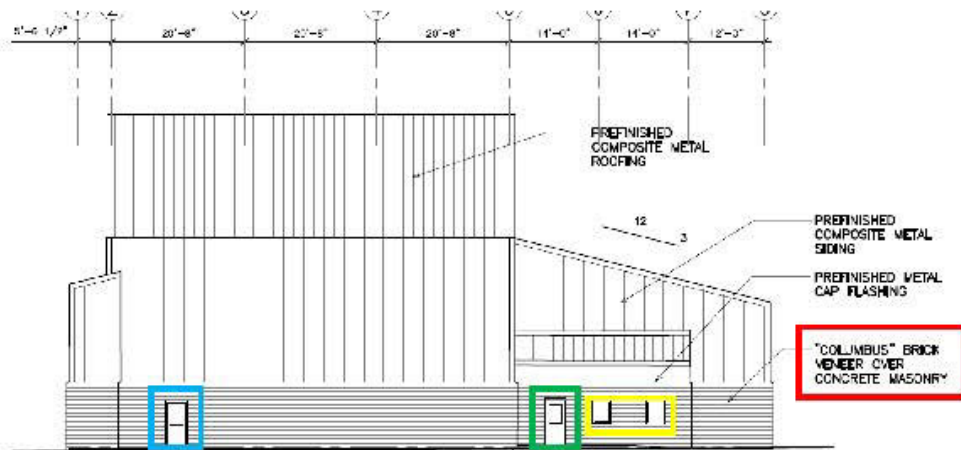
Image showing the proposed configuration of the southwest elevation. The note indicated in red, which is shown on the 35 percent design plans, indicated that brick veneer would be installed; however, that design element has been removed to avoid impacts to the historic property. The door that would be shifted is noted in blue, the door that would be replaced in-kind is noted in green, and the two new windows within the addition are noted in yellow.
